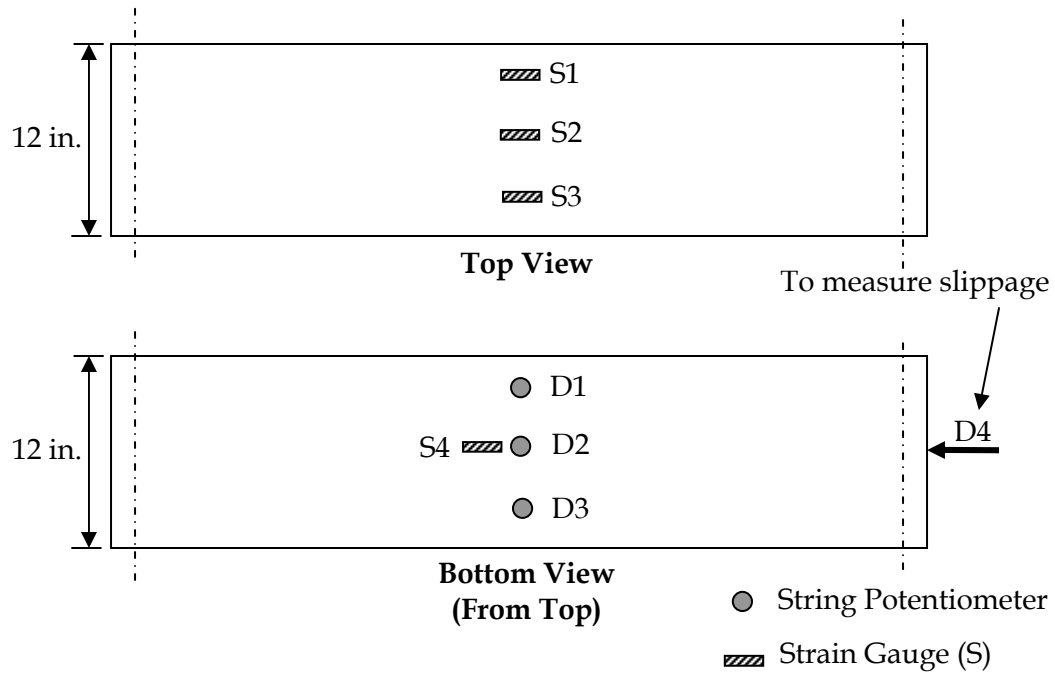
Instrumentation Plan for the Uniform Section Ductal®-FRP Deck Specimen
